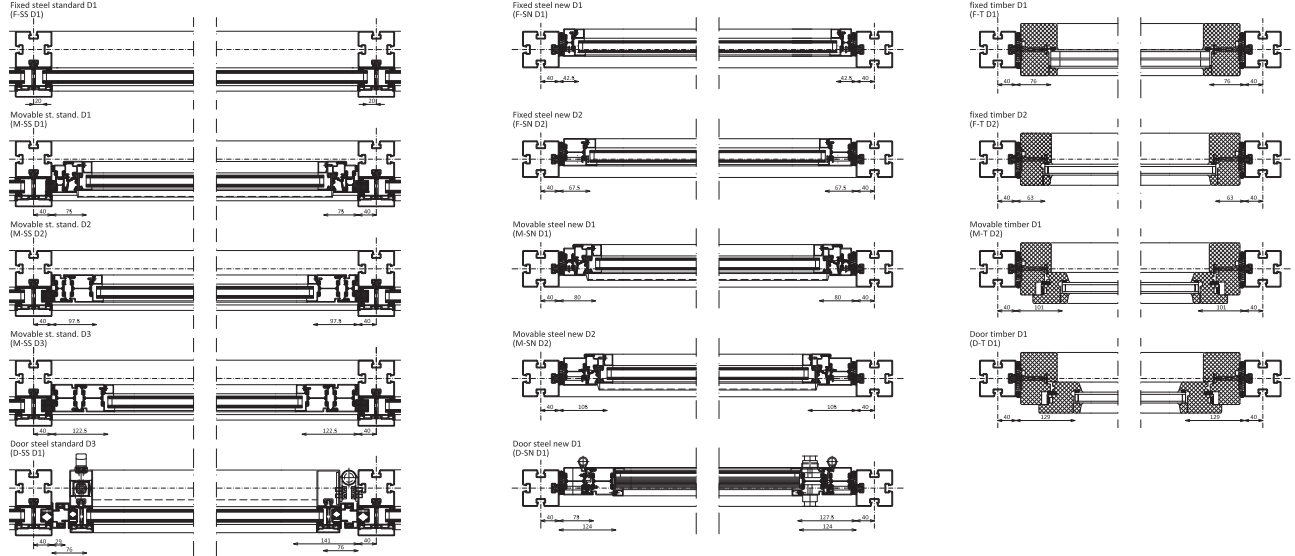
Product inventory with horizontal and vertical technical detailing of three types of curtain walls: standard steel curtain wall details (left), steel curtain wall with increased functionality (middle), and timber curtain wall with increased functionality (right) (technical details defined in collaboration with Kloeckner Metals ODS Nederland & Jansen AG).
